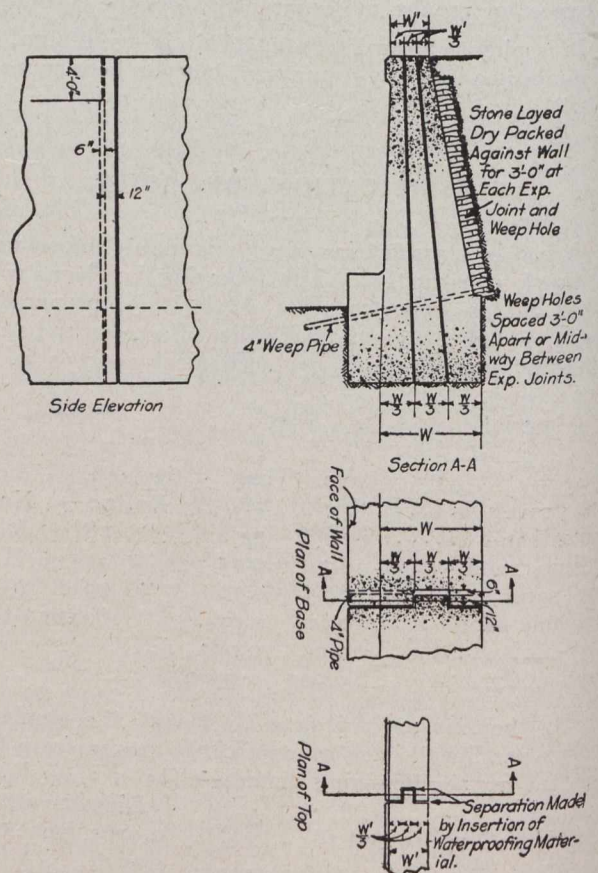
An Expansion Joint for Plain Concrete Walls.
